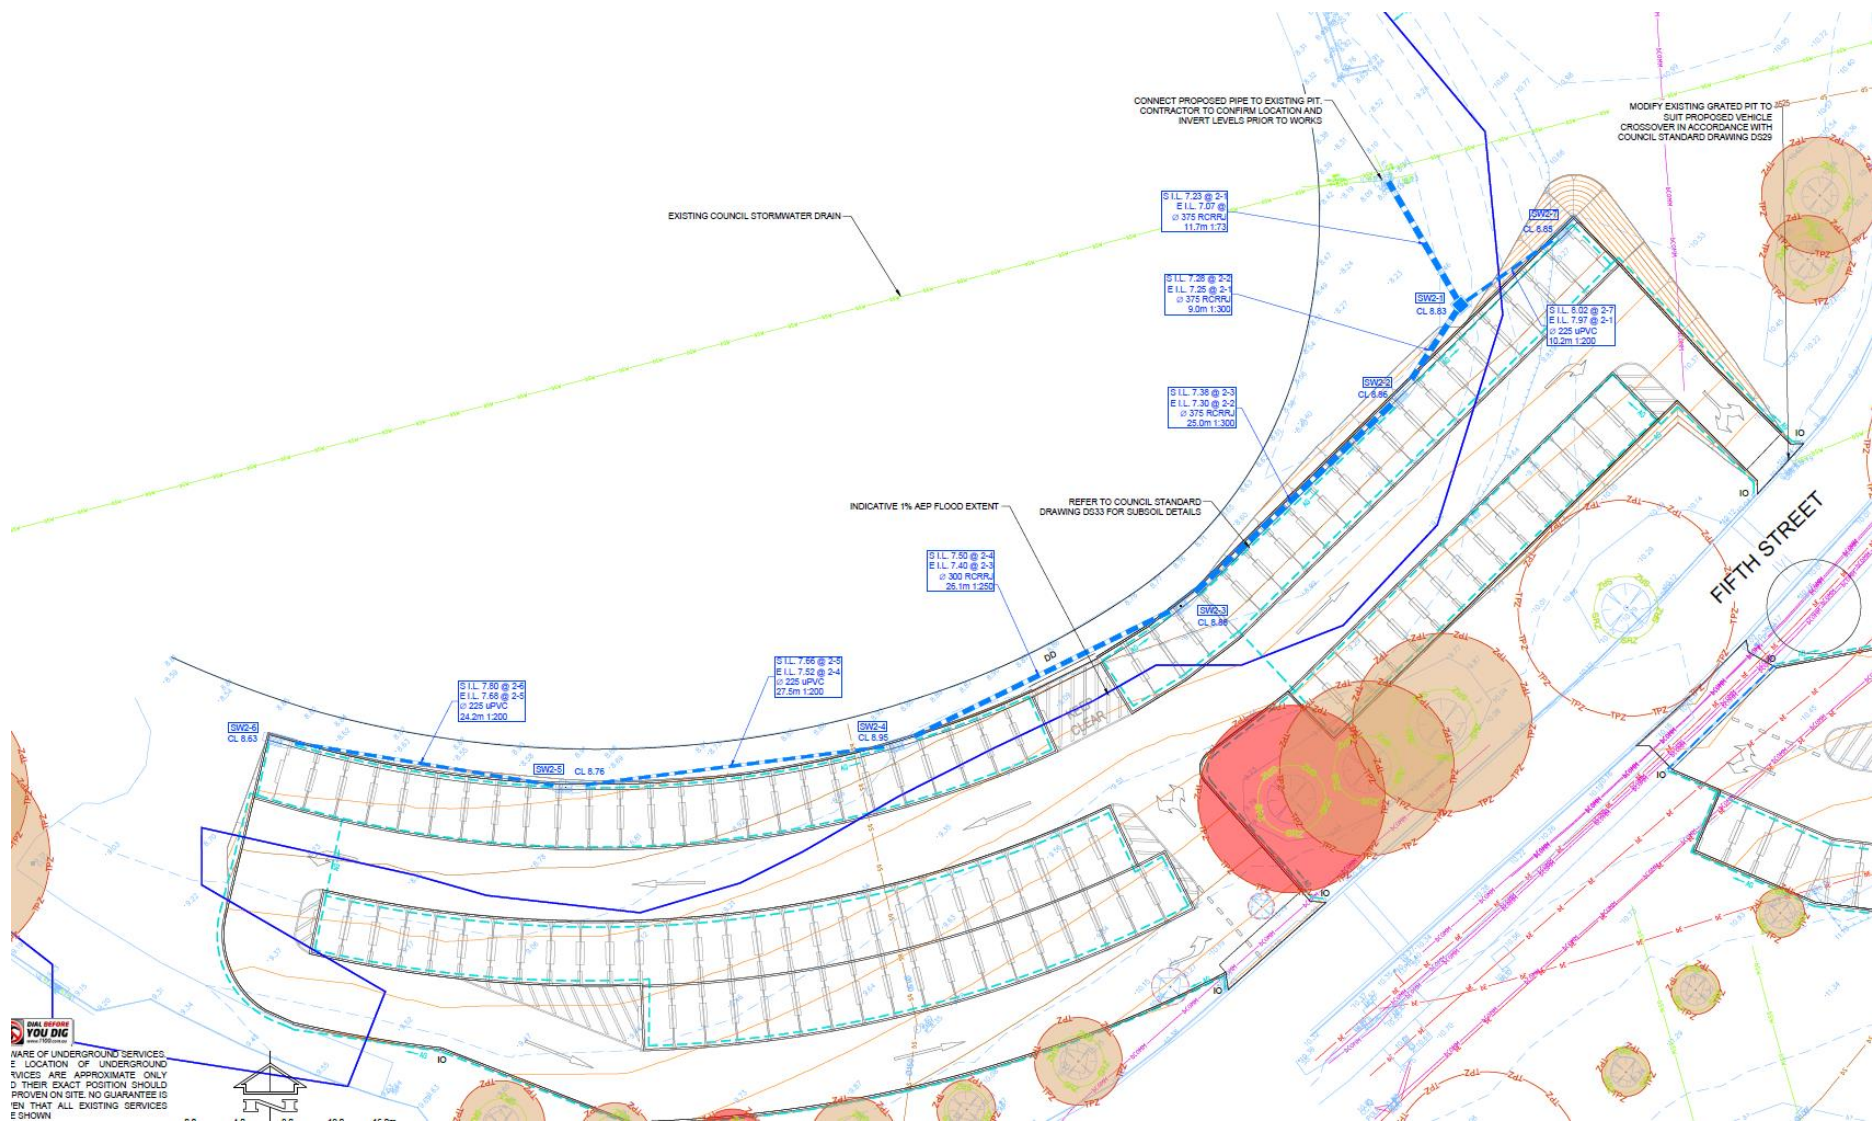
Stormwater and Drainage Plan for Western Car Park
